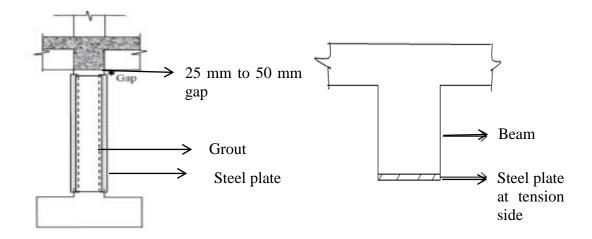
(a): Column steel plating (CPWD 2007) (b): Steel plate at tension side of beam
